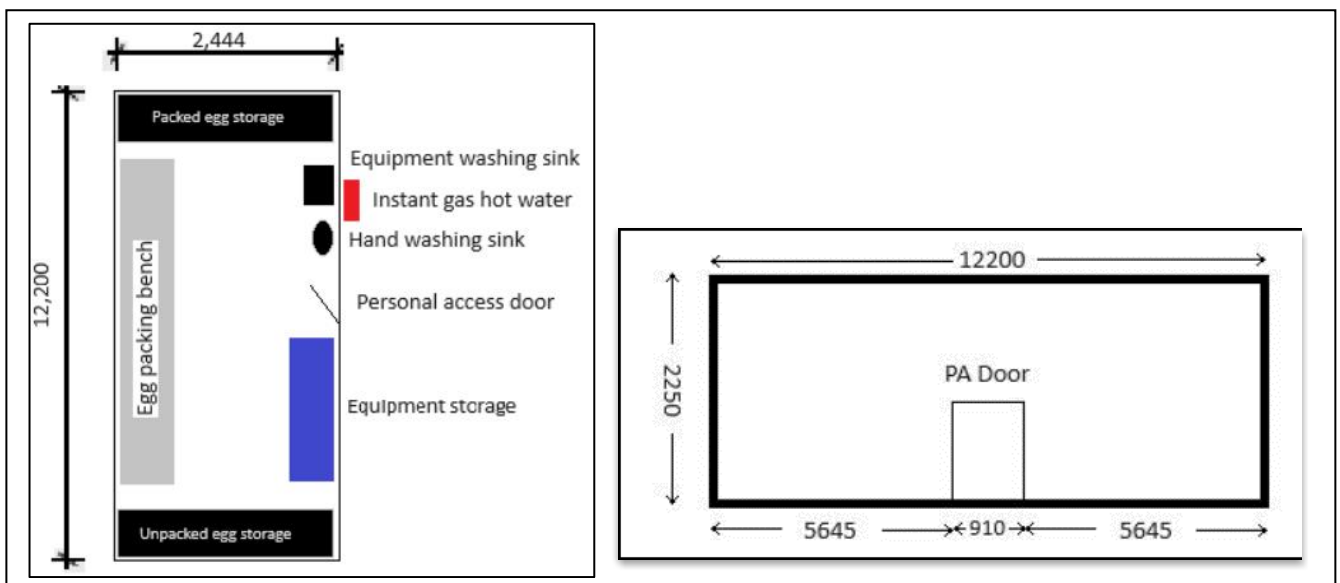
Floor plan (left) and Elevations (right) of the egg packing facility.
